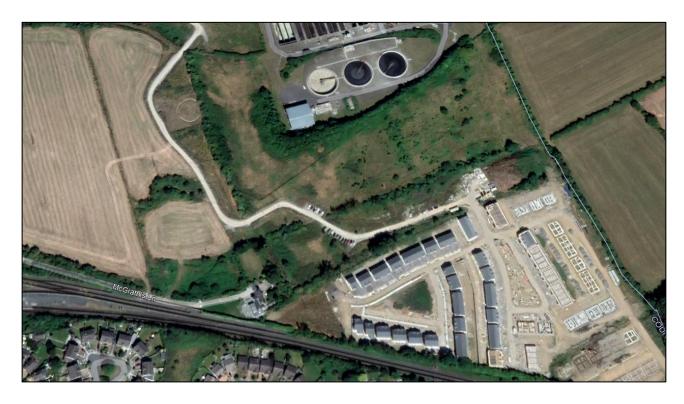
Image showing the construction of Newtown View and the completed excavation of the enclosure where the access road was deliberately placed to avoid the archaeological site (August 2022) (Source: Google Earth Pro)
